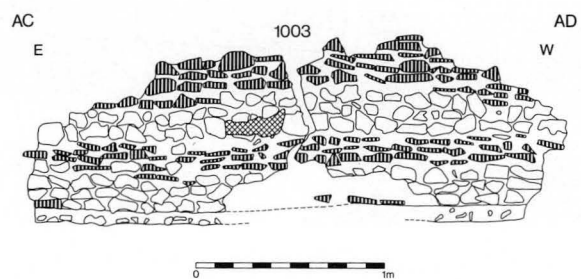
Elevation AC–AD of interior face, south side of tower. Scale 1:40
